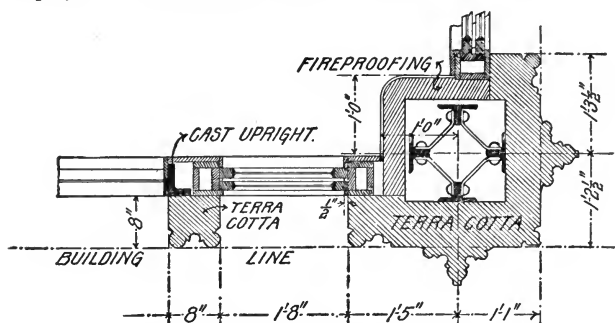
Detail of Corner Pier and Column. Reliance Building.
